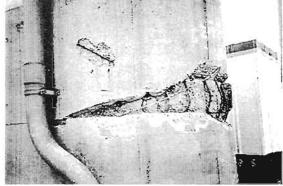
Hanshin Expressway, Kobe: Damage to large pier at level of construction joint and/or curtailment of reinforcement.
